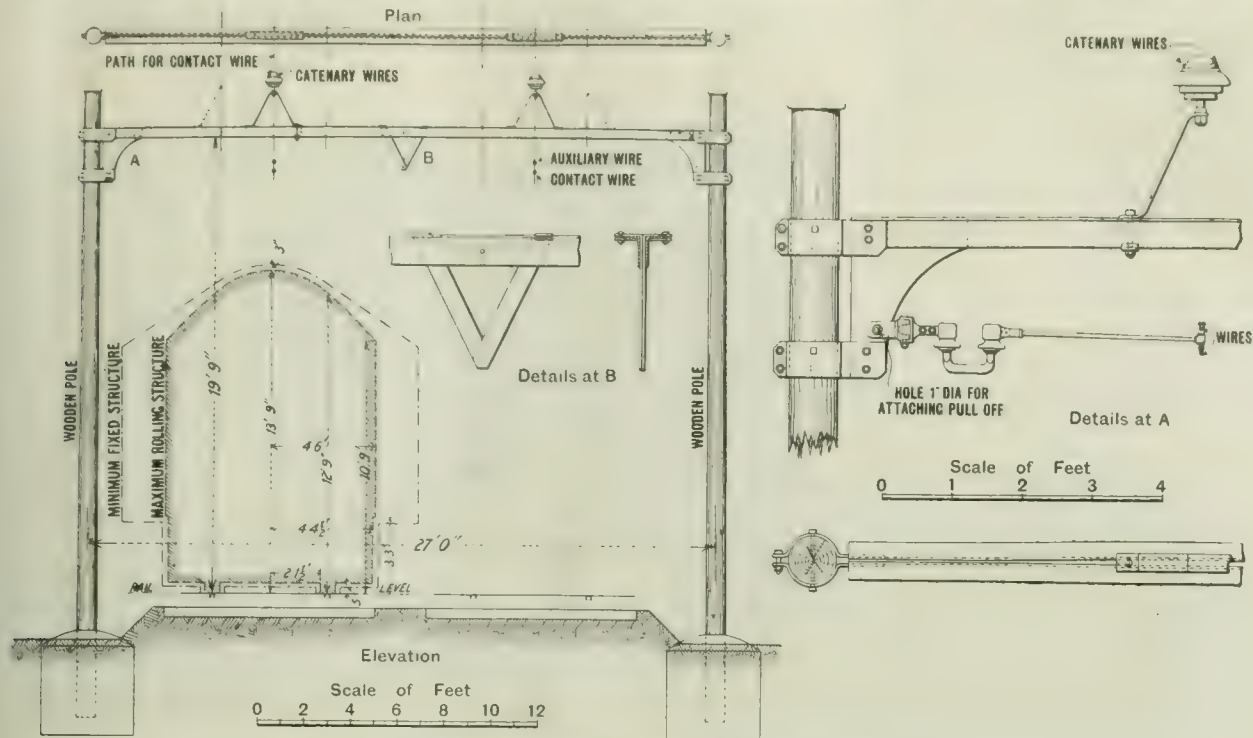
DIAGRAM SHOWING DETAILS OF OVERHEAD CONSTRUCTION.
